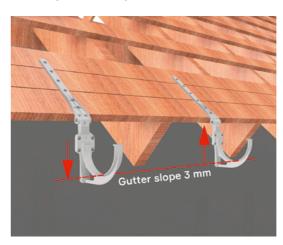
Mounting PVC brackets with adjustable fastening elements on the sheathing
